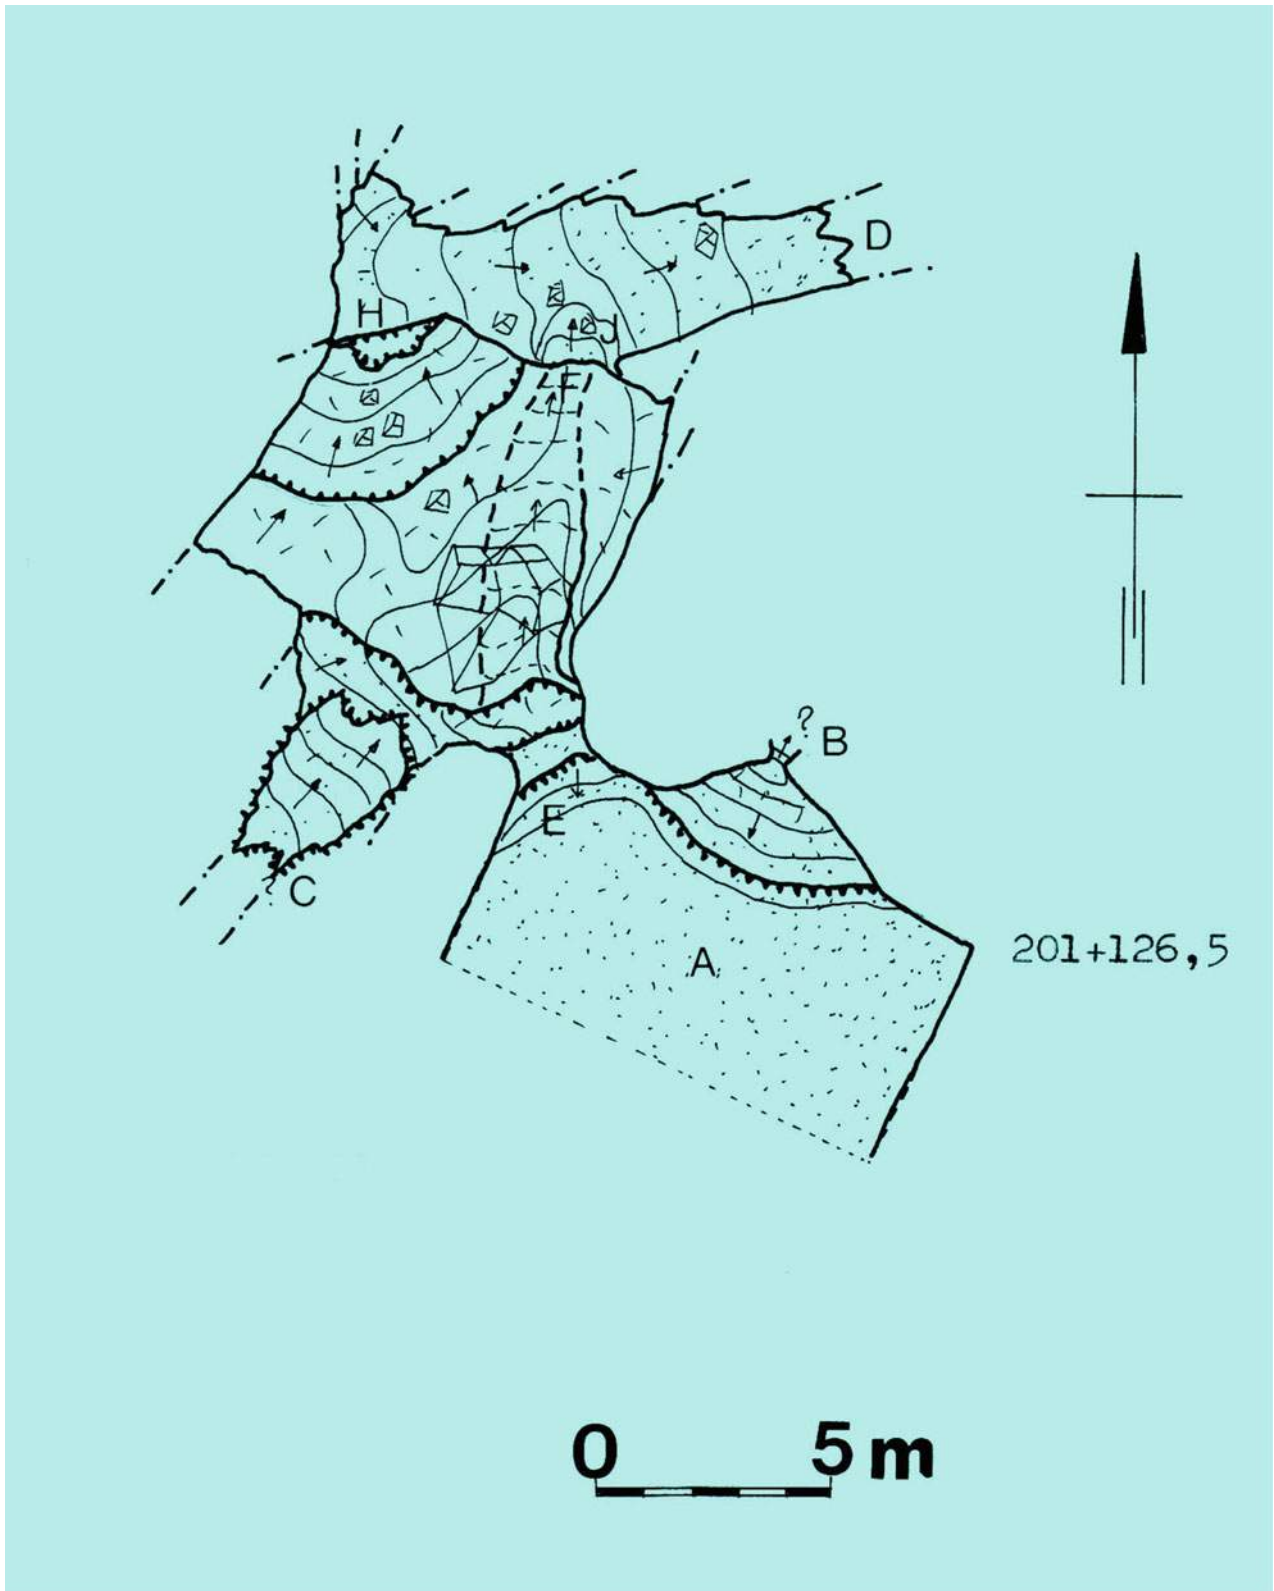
Plan of cavern at km 201 + 126 in Sveti Rok Tunnel
